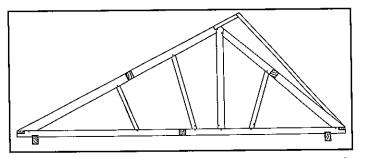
Elevation of a roof truss in the mid-eighteenthcentury wing. In an unusual fashion, the angled struts extend to the bottom chord of the truss instead of springing from the base of the (vertical) king post, the more common method of attachment. Note that the peak of the roof was initially intended to be lower but was raised during construction to match the height of the western block. Drawing by Willie Graham, 1999.
